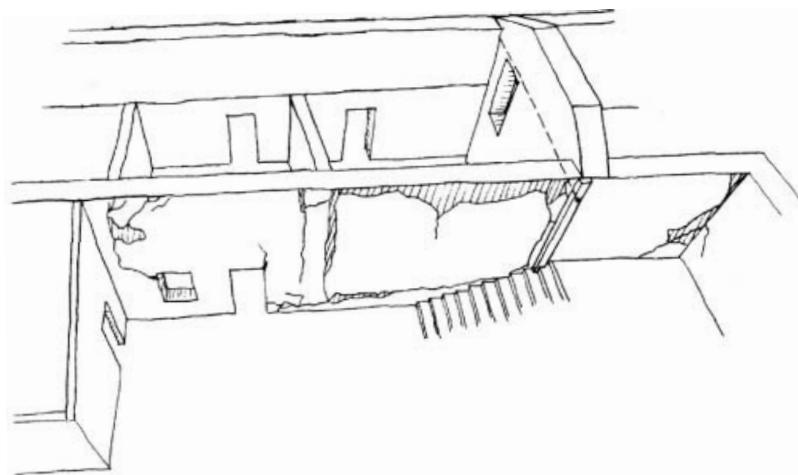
Drawing of damage to the north wall of the south wing, similar to that shown in Figure 4.13.
